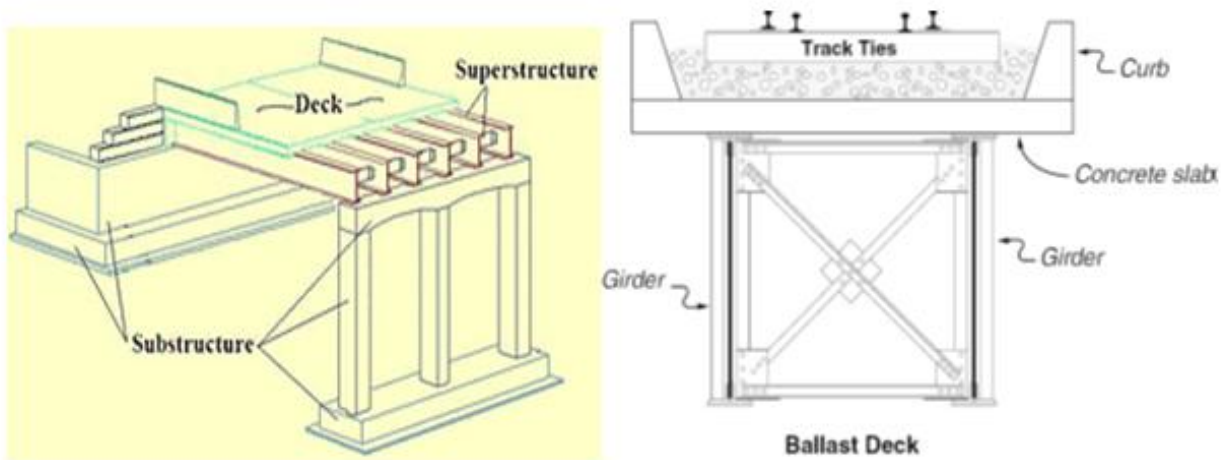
Bridge Components (Oklahoma Bridge Tracker, 2009) and a Ballasted Railroad Deck (AREMA, 2003)
